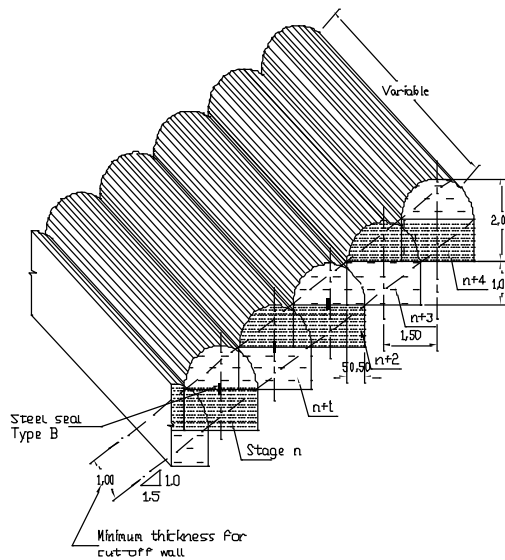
Sogamoso dam: Construction scheme of cutoff wall and superposed concreted galleries
